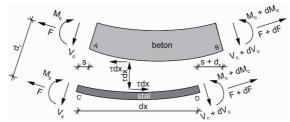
Interface slip between steel and concrete (reinforced concrete) parts.
